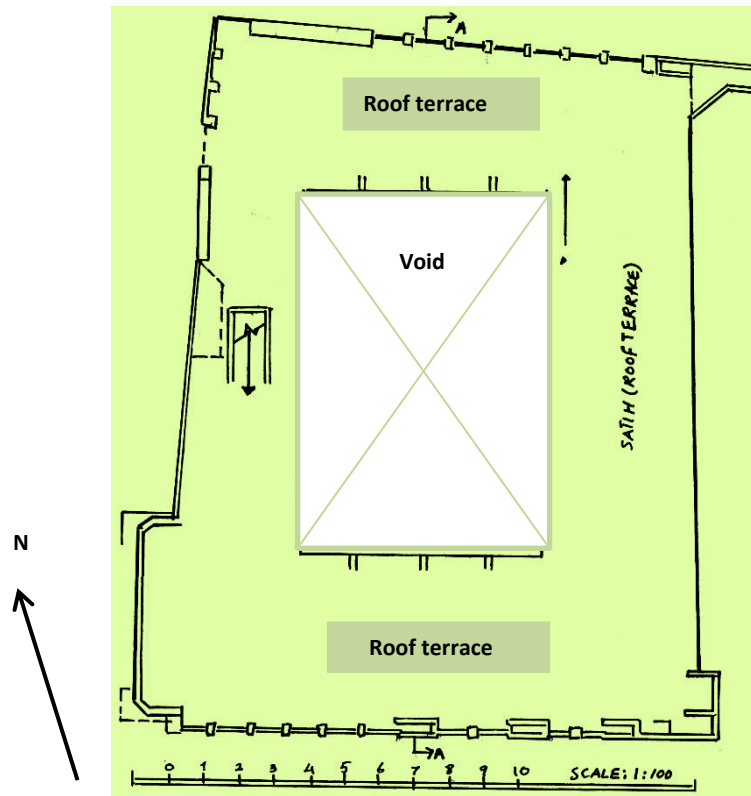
Roof terrace level plan of traditional courtyard house No. 2. Scale: 1:50
